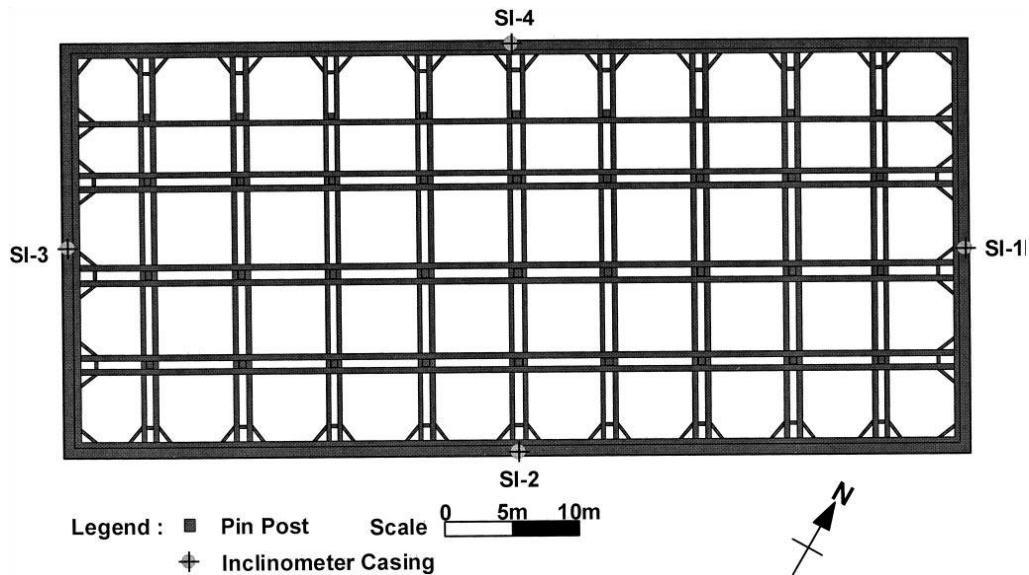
Plan layout of MRRB Project (Hsieh et al., 2003)
